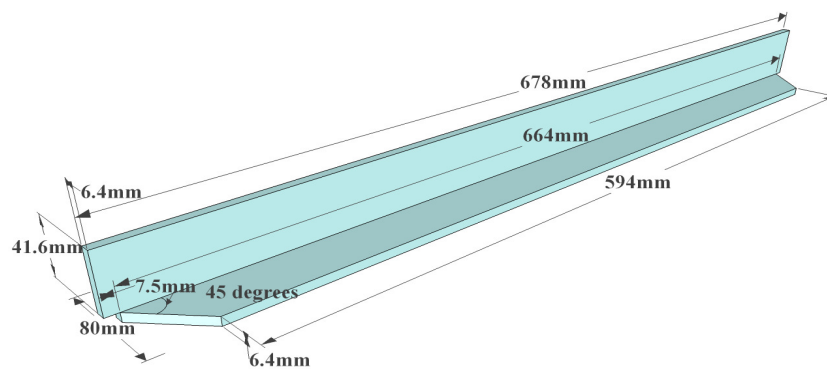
Diagonal GFRP pultruded section stiffener used in specimen B6
